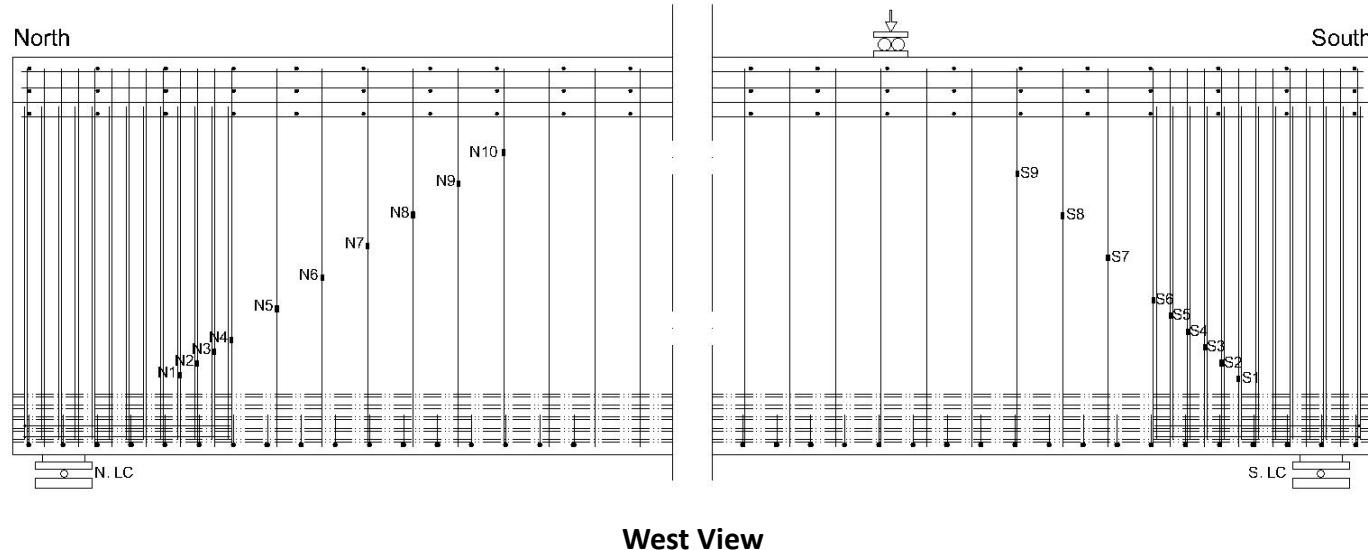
Layout of Strain Gauges on Transverse Reinforcement for Girder E1-South End Testing (Labib 2012)
